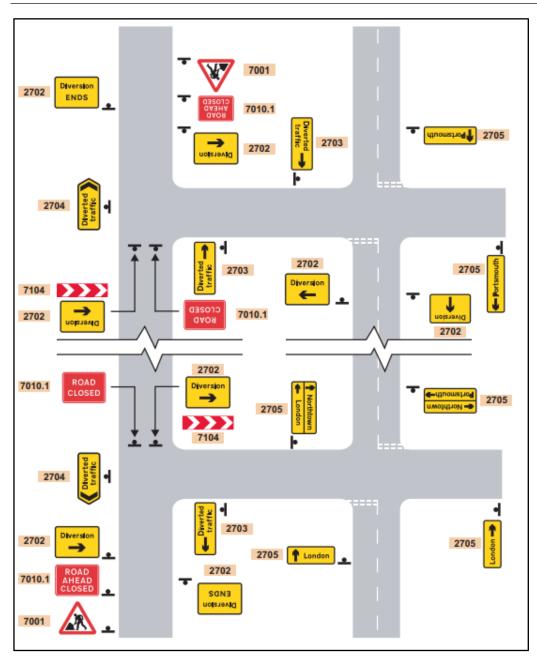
Layout of signs for works on single carriageway roads with diversions
